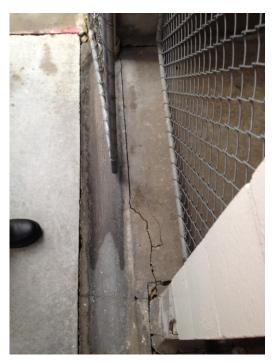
Cracks and separation of floor slab on the order of 1.0mm – 4.0mm at construction joints and at walls.
